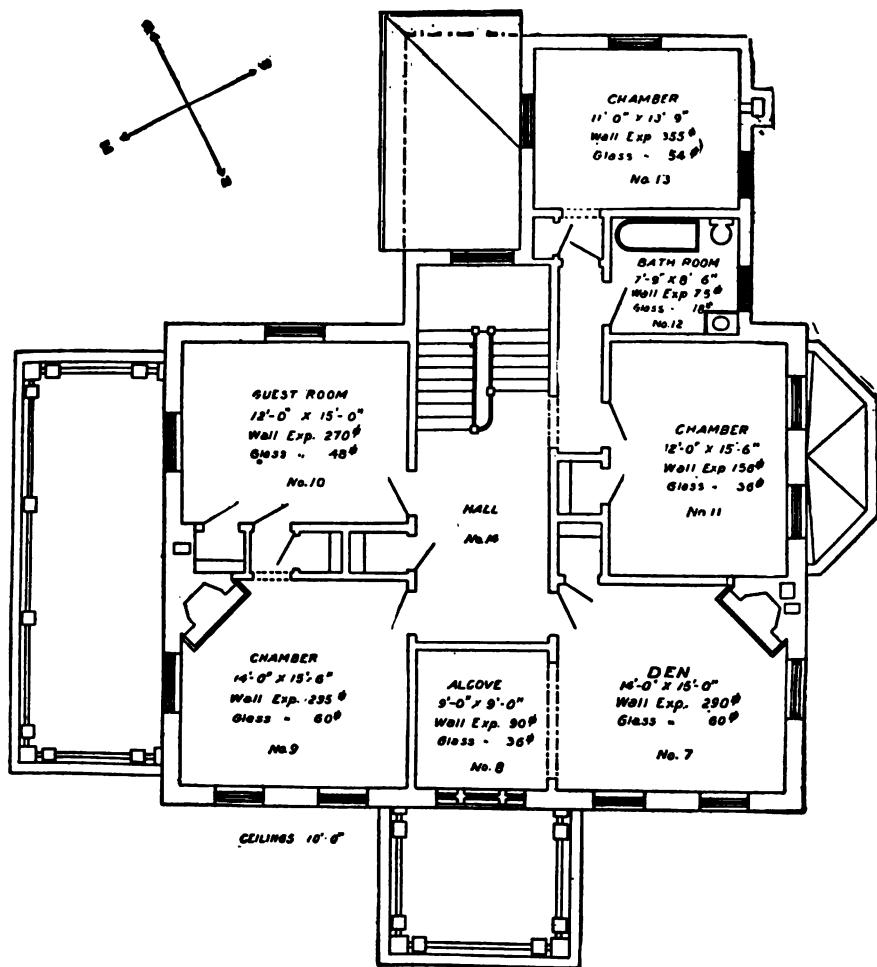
Second Floor Plan, Giving Square Feet of Wall and Glass Exposure.
